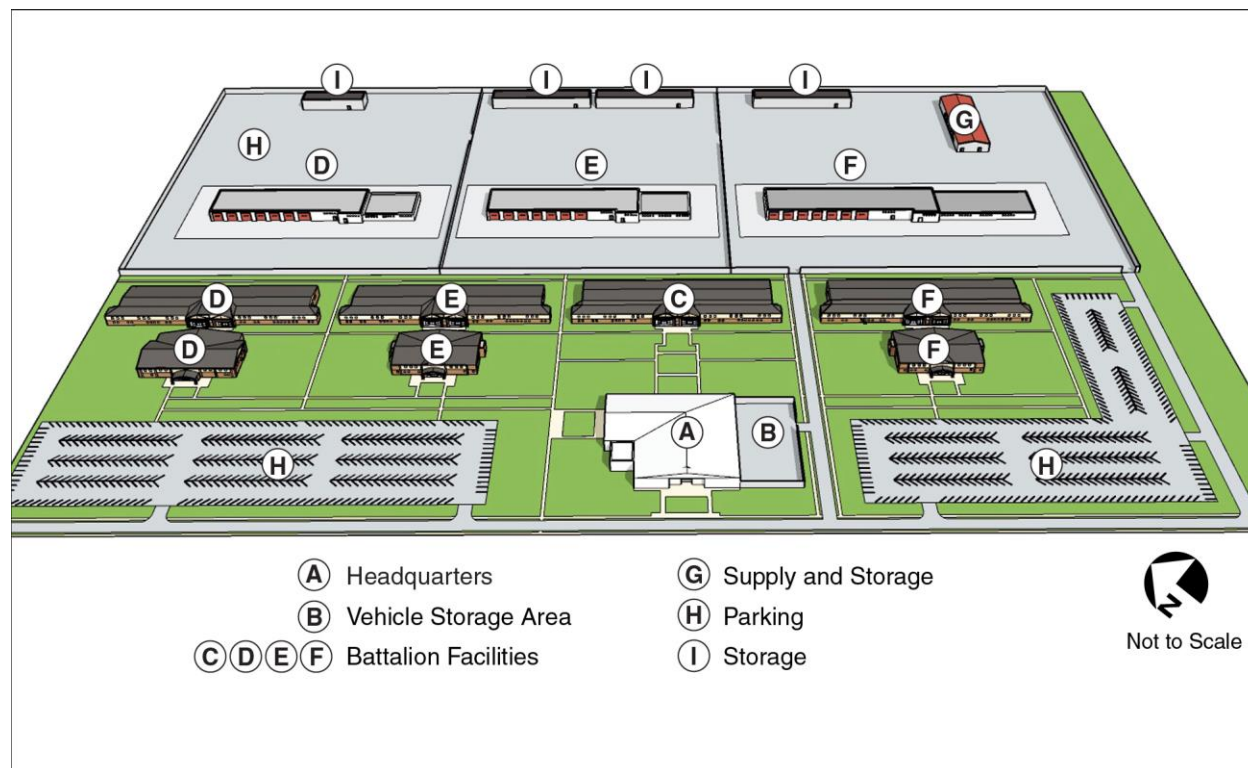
MDTF Conceptual Site Plan – Full Configuration
